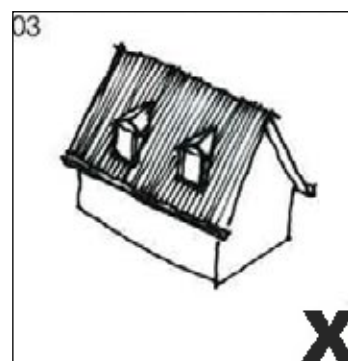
(m) Tiled roof forms are strongly discouraged.(l)
